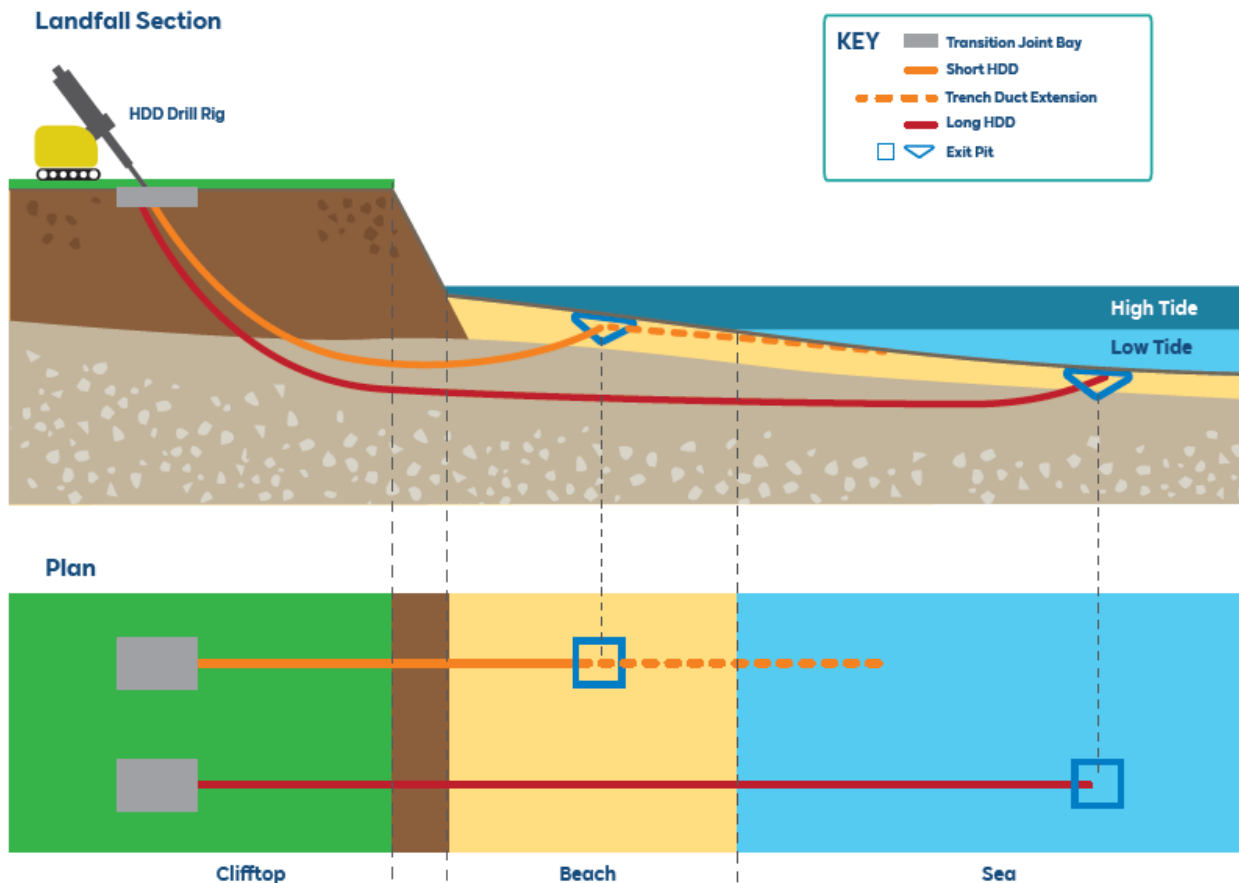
Illustrative Section and Plan Landfall Works HDD options
